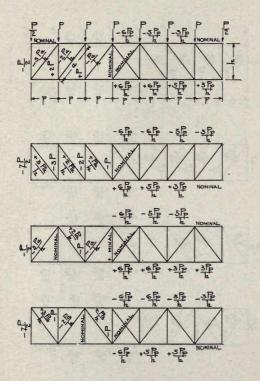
PLATE VIII TRUSSES WITH PARALLEL CHORDS
